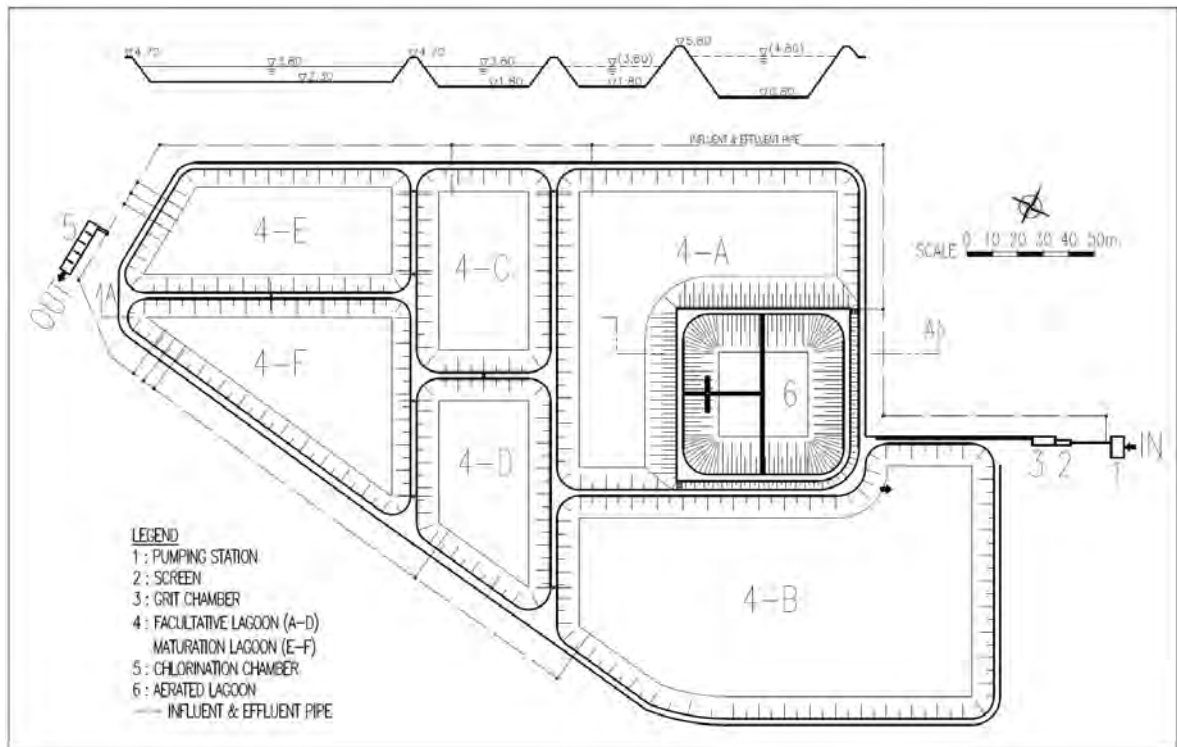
GENERAL PLAN OF KAOLACK SEWAGE TREATMENT PLANT
